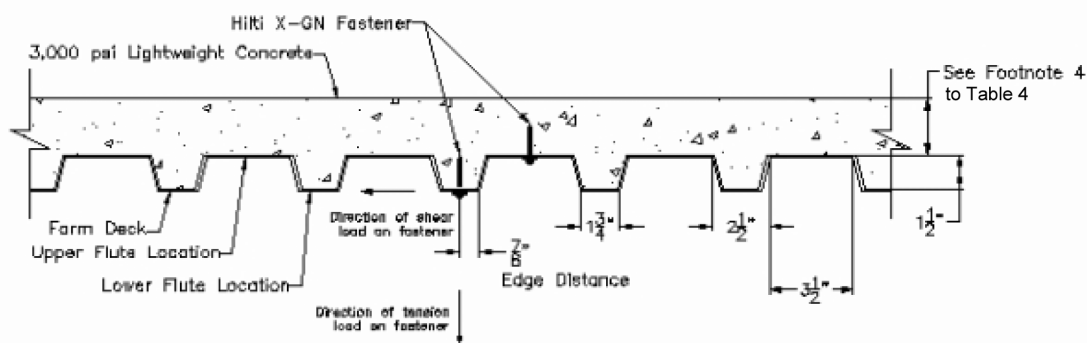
HILTI FASTENER INSTALLATION LOCATION IN 1 1/2-INCH-DEEP COMPOSITE FLOOR DECK
